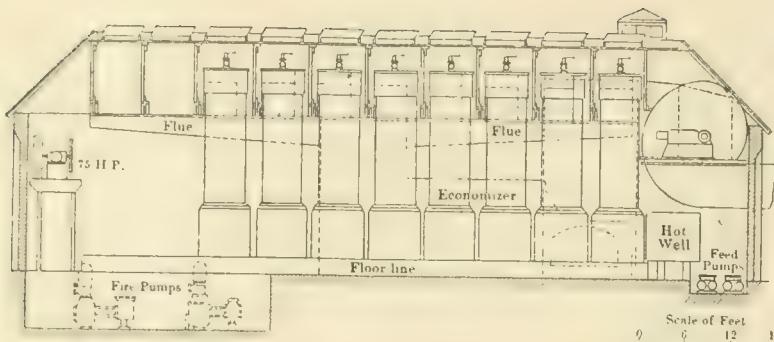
LONGITUDINAL ELEVATION AND SECTION OF BOILER-HOUSE.
